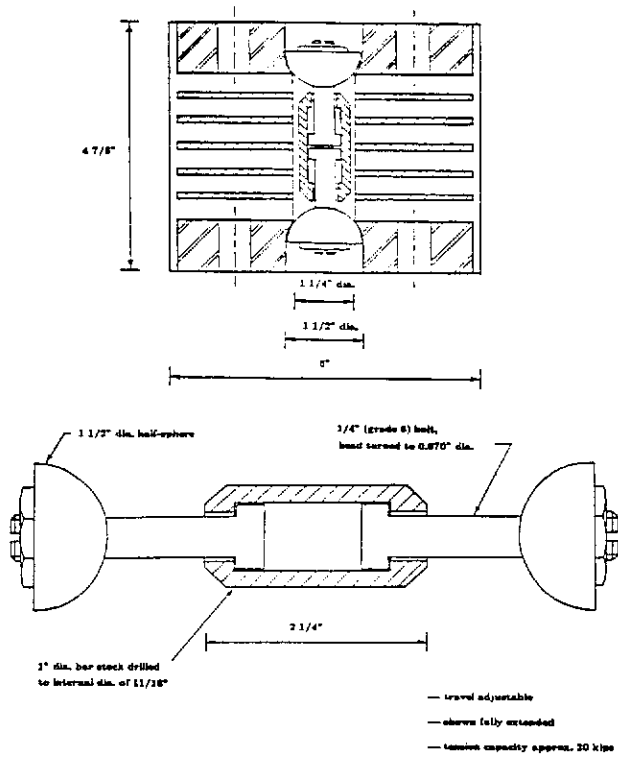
BEARING MODIFIED TO ACCEPT DISPLACEMENT CONTROL DEVICE
